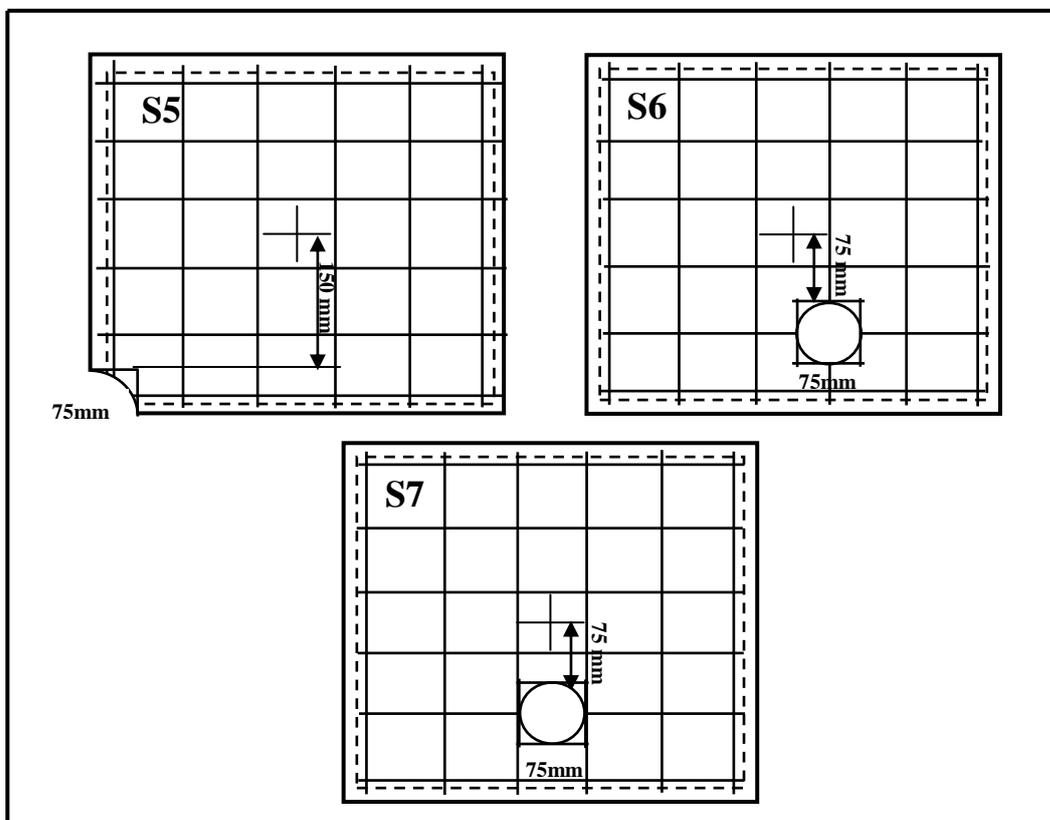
Dimensions and Reinforcement Details of Slabs in Group (B)
